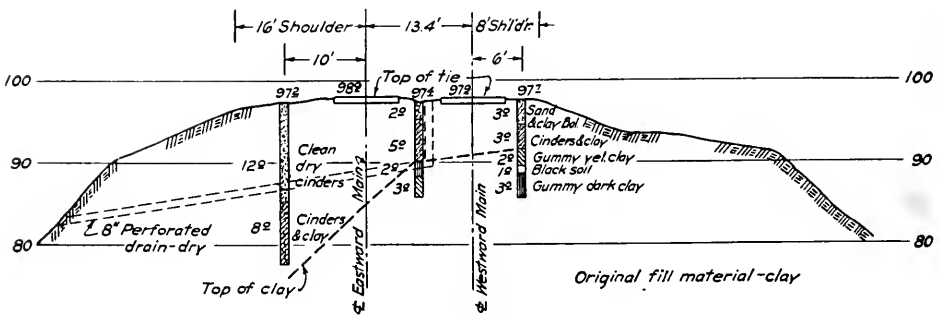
Typical Section of Unstable Fill on the Burlington, Showing Clay Line as Determined from Borings.
